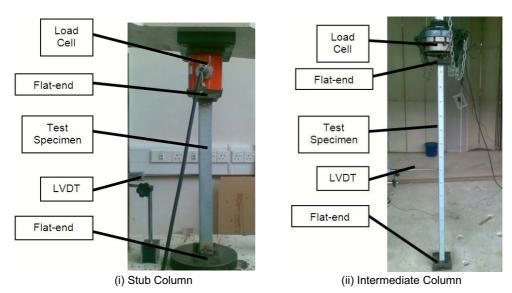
Test Setup for Stub and Intermediate Column Compression Test
